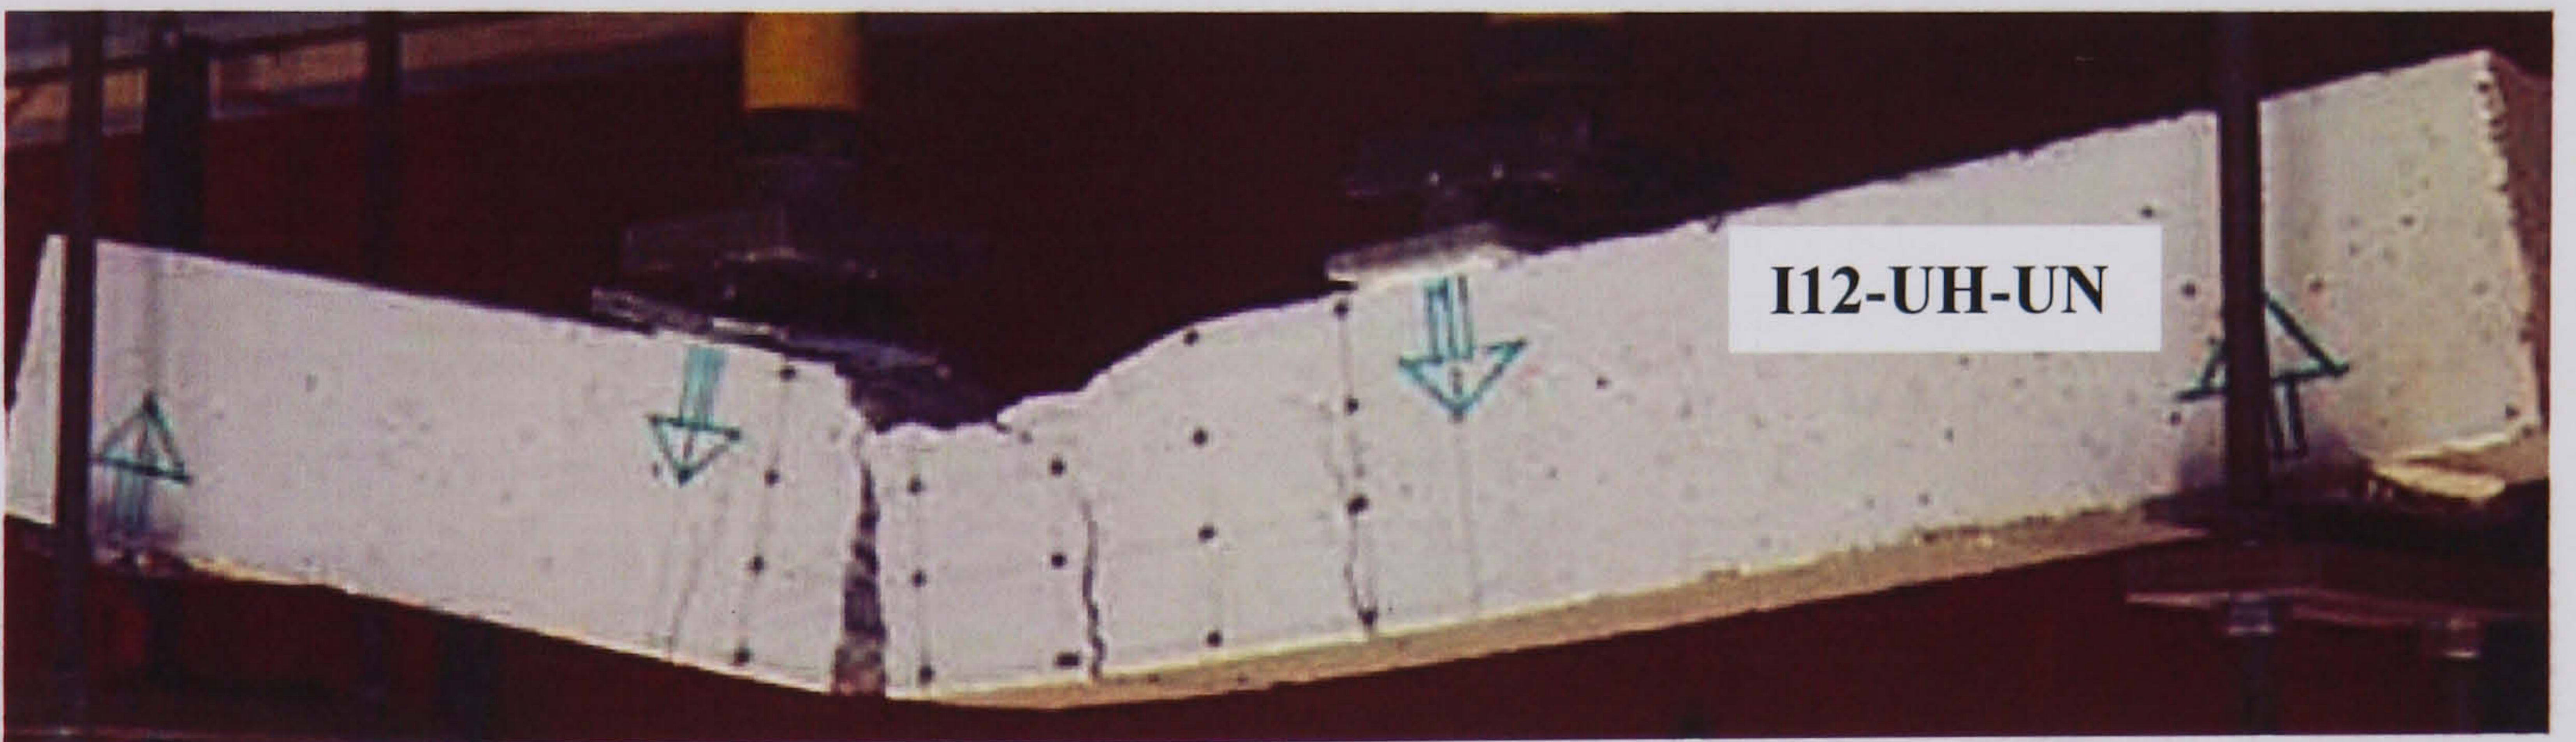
Typical flexure failure due to steel yielding near to the left point load, beam I12-UH-UN.
